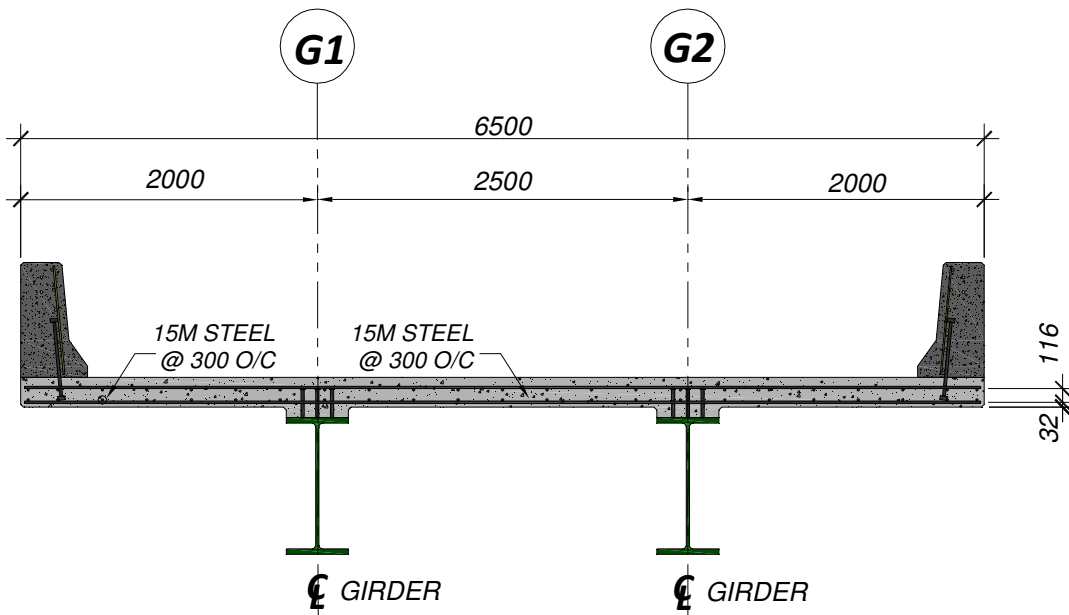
(c): Typical cross section illustrating the bottom reinforcement details for the section with steel reinforcement (Cross section “E” from Figure 3-9(a))
